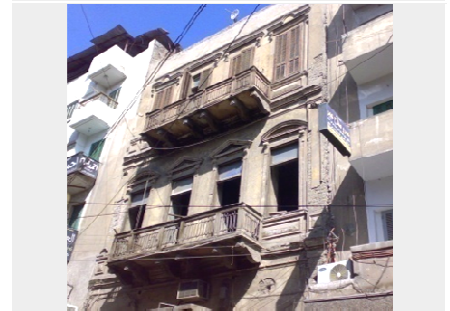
One of the sector (D)'s buildings that has wall bearing system
